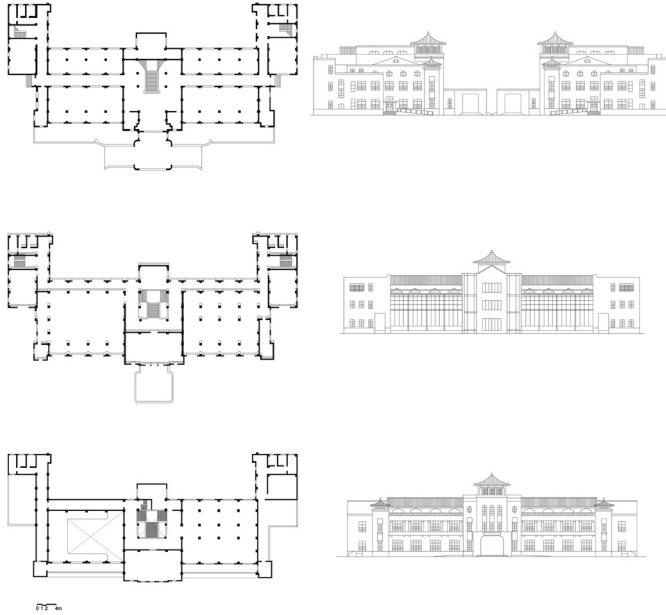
The current plans and façades of the old Kaohsiung City Hall building. (Source: the author)
